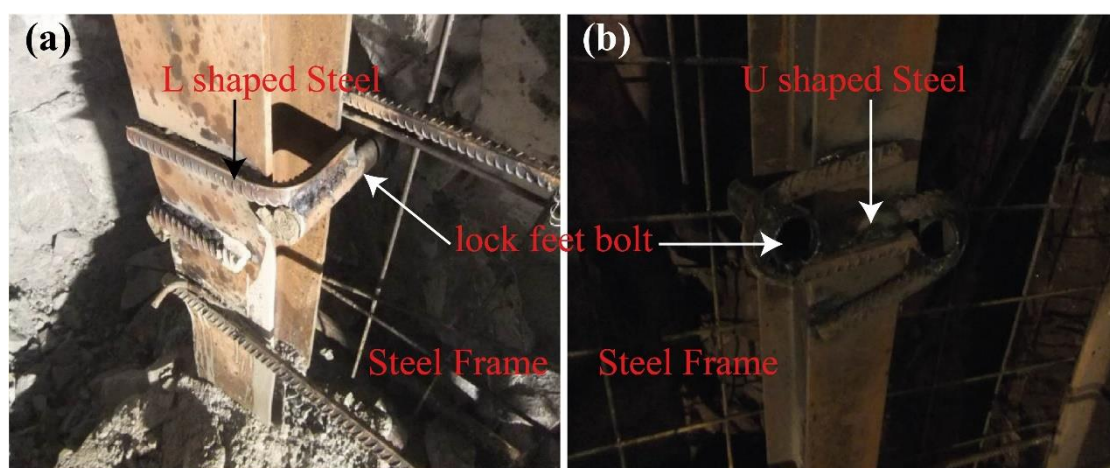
(a) L-shaped and (b) U-shaped steel assembly (modified after Cao et al., 2018).
